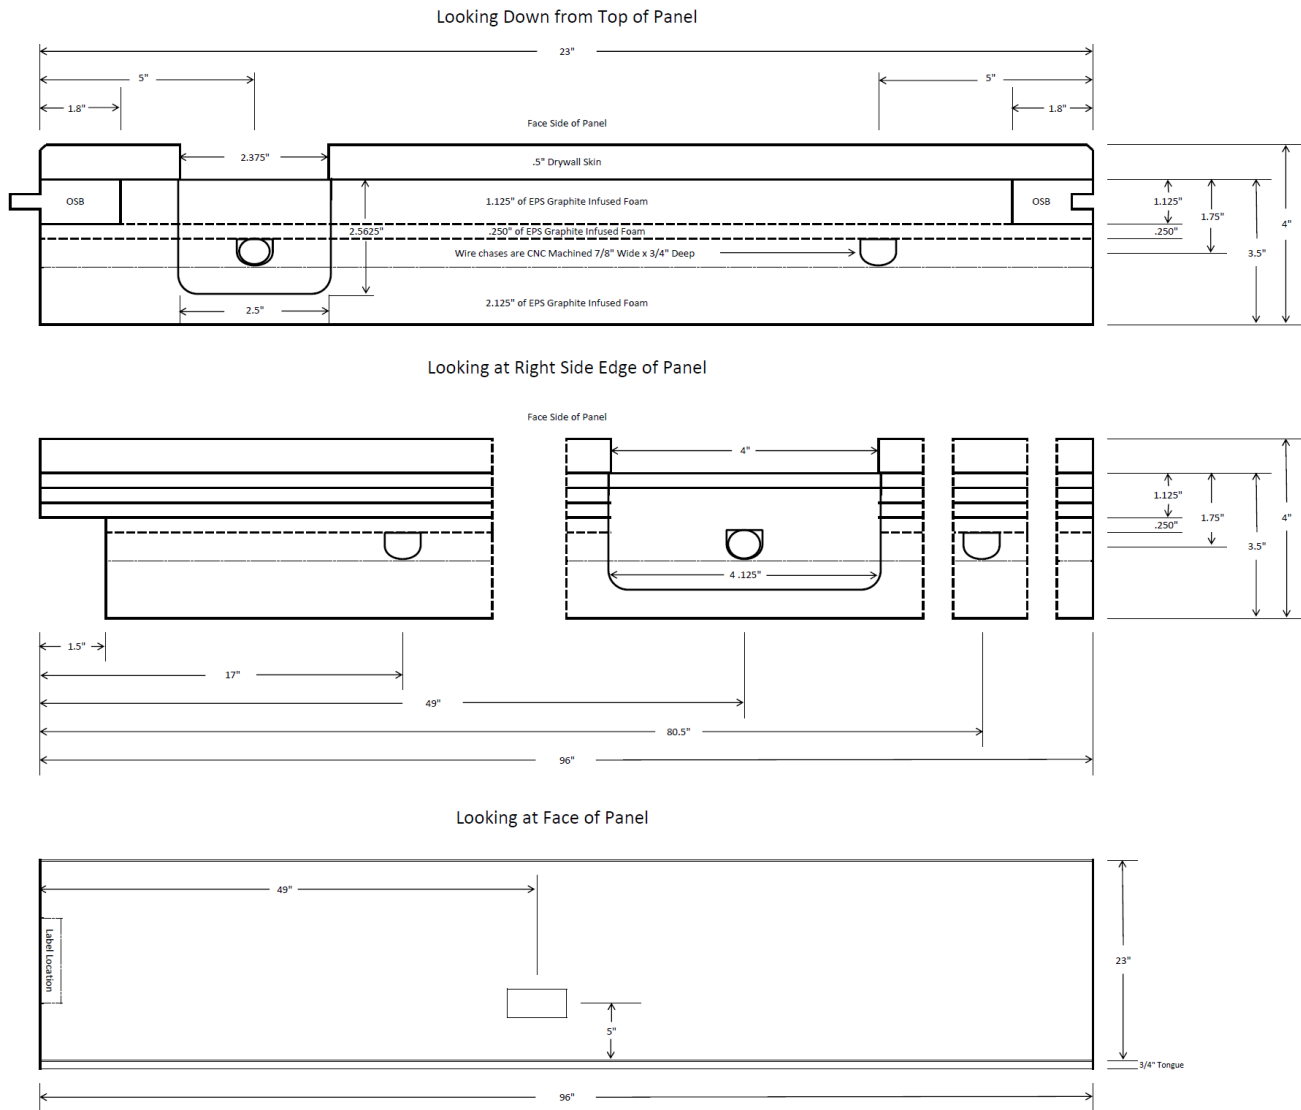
SmartWall Light Switch Panel, Dimensional Overview
